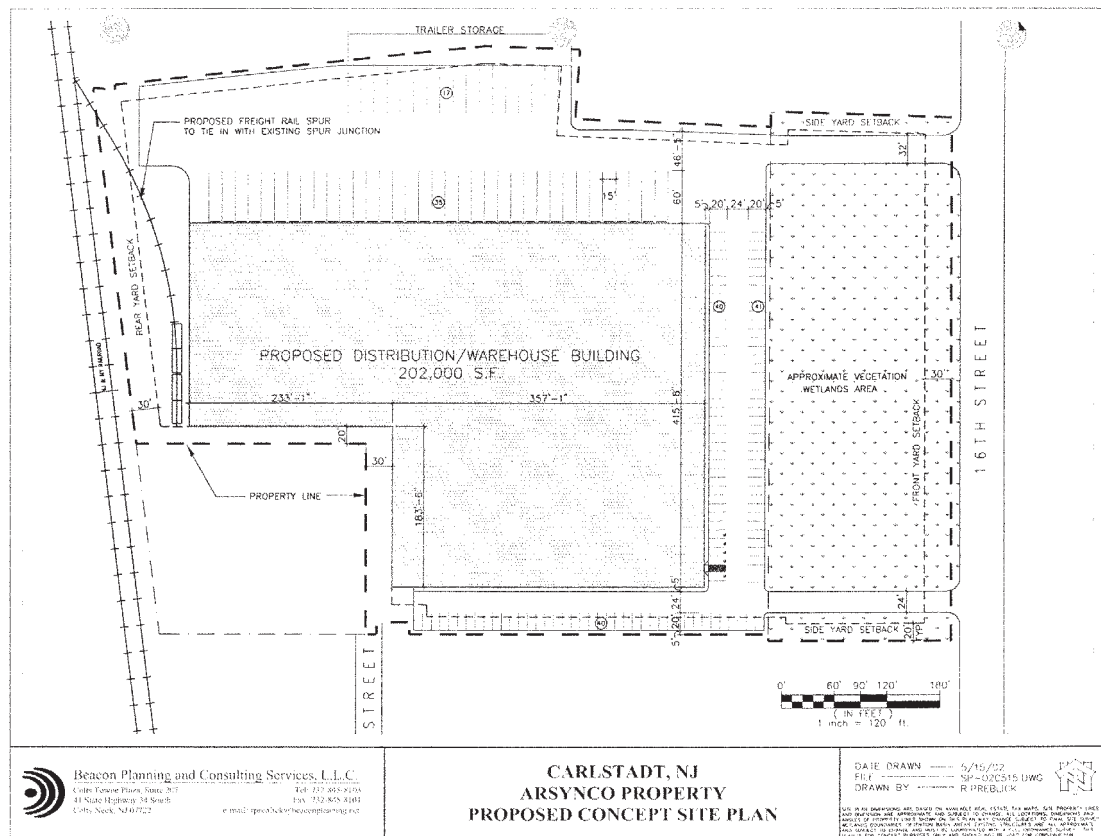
Proposed Concept Site Plan for Arsyngo Site
